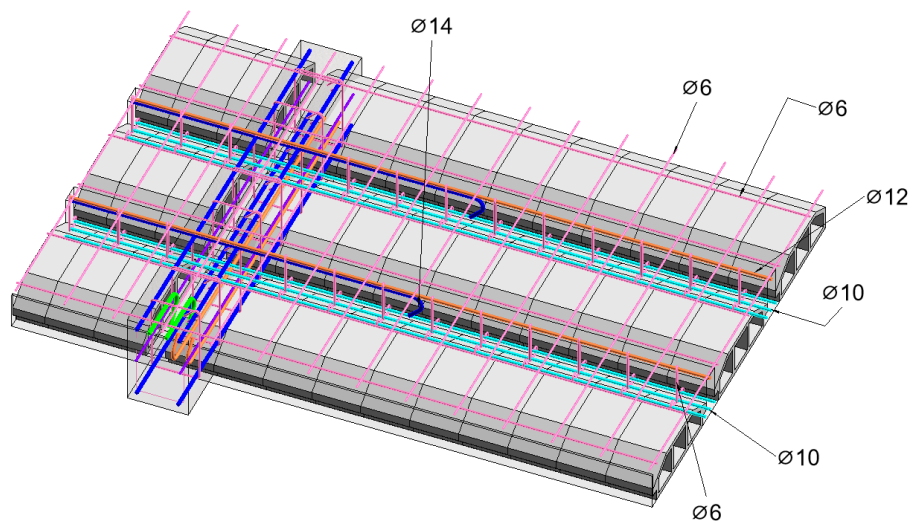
61. 3D view of the steel reinforcement for the ribbed hollow block slab
